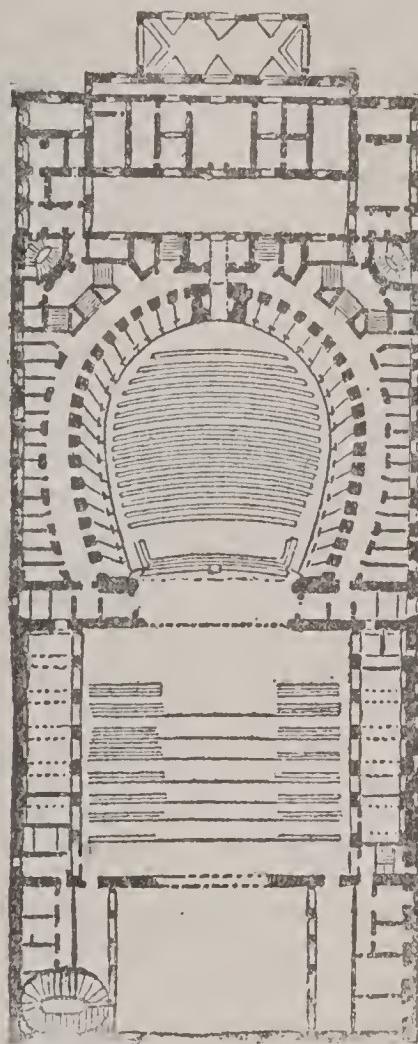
Plan of La Scala Theatre at Milan—scale, 100 feet = 1 inch
